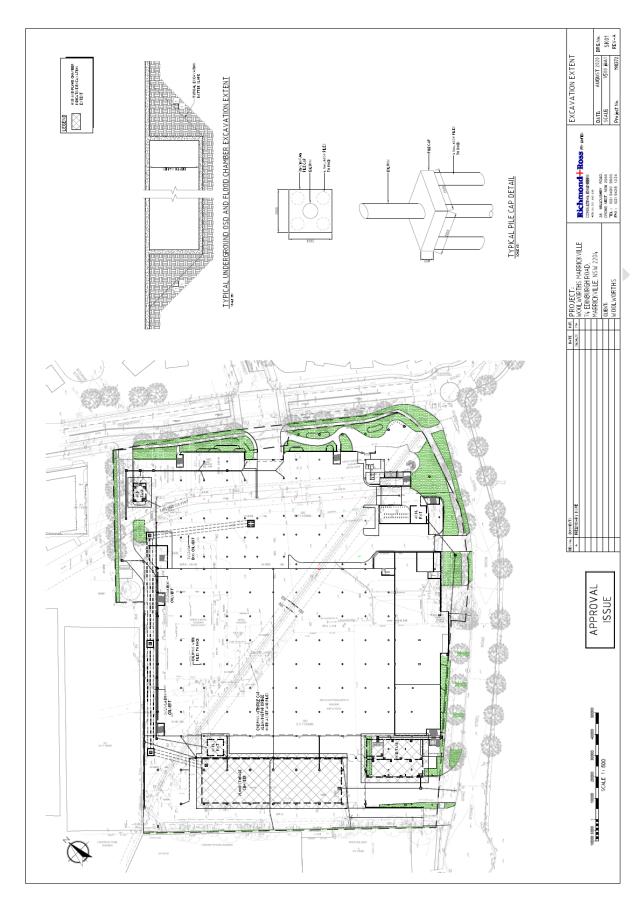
Plan of subsurface impacts of proposed works Source: Richmond+Ross
